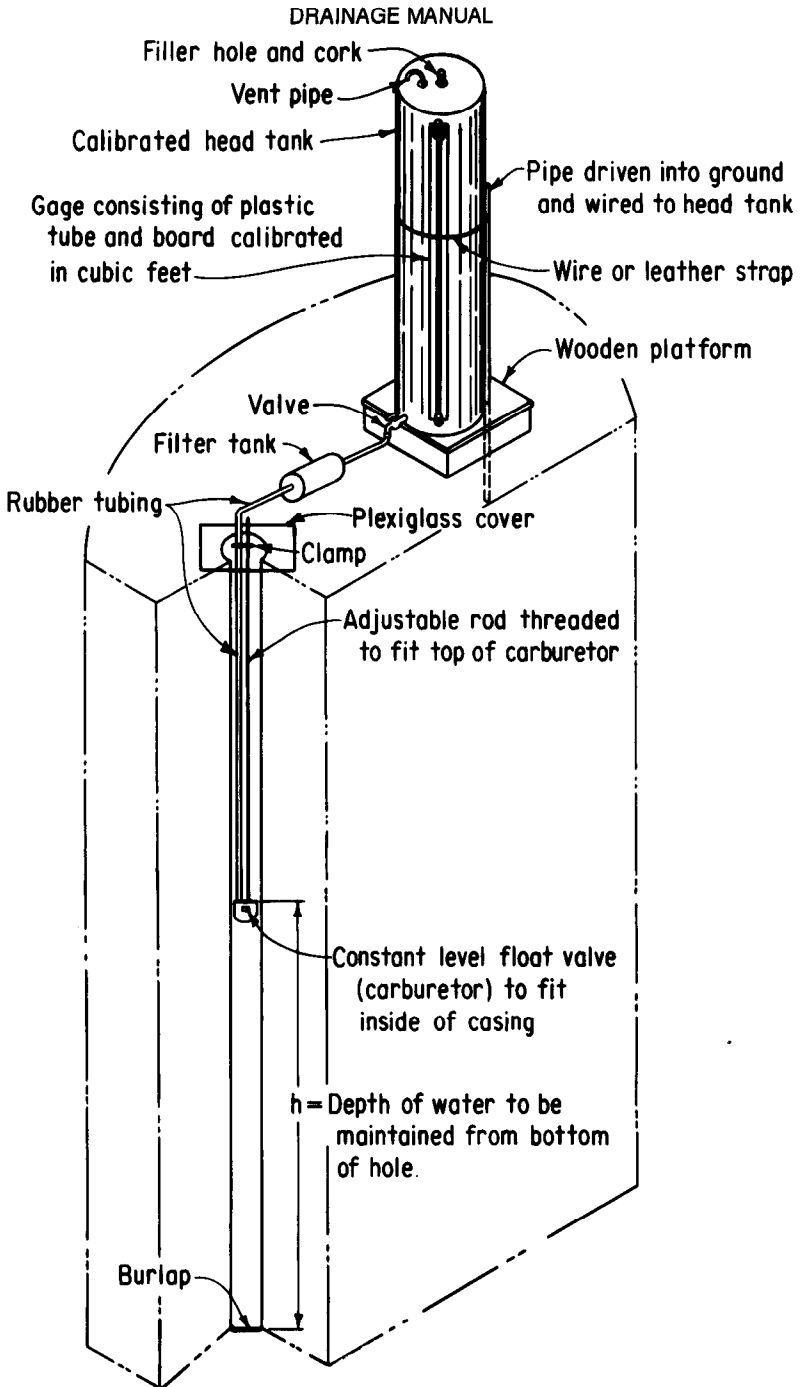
Equipment setup for a shallow well pump-in test.
